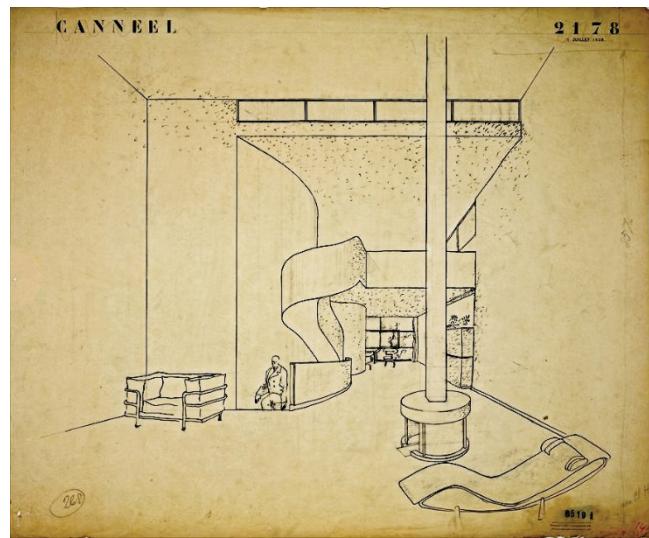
Maison Canneel – Interior perspective drawing © Fondation Le Corbusier
